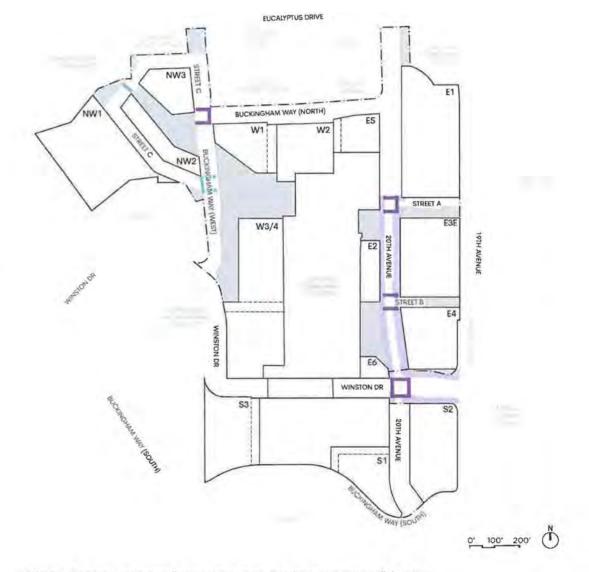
Special Sidewalk Zone paving areas and decorative crosswalk locations
